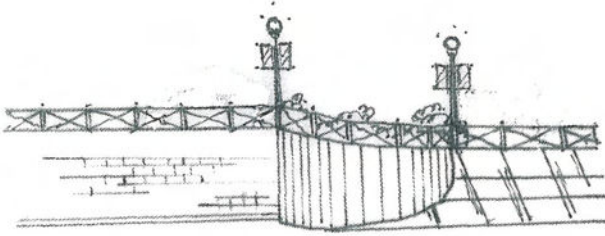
Sketch illustrates integration of old and new wall structure.
